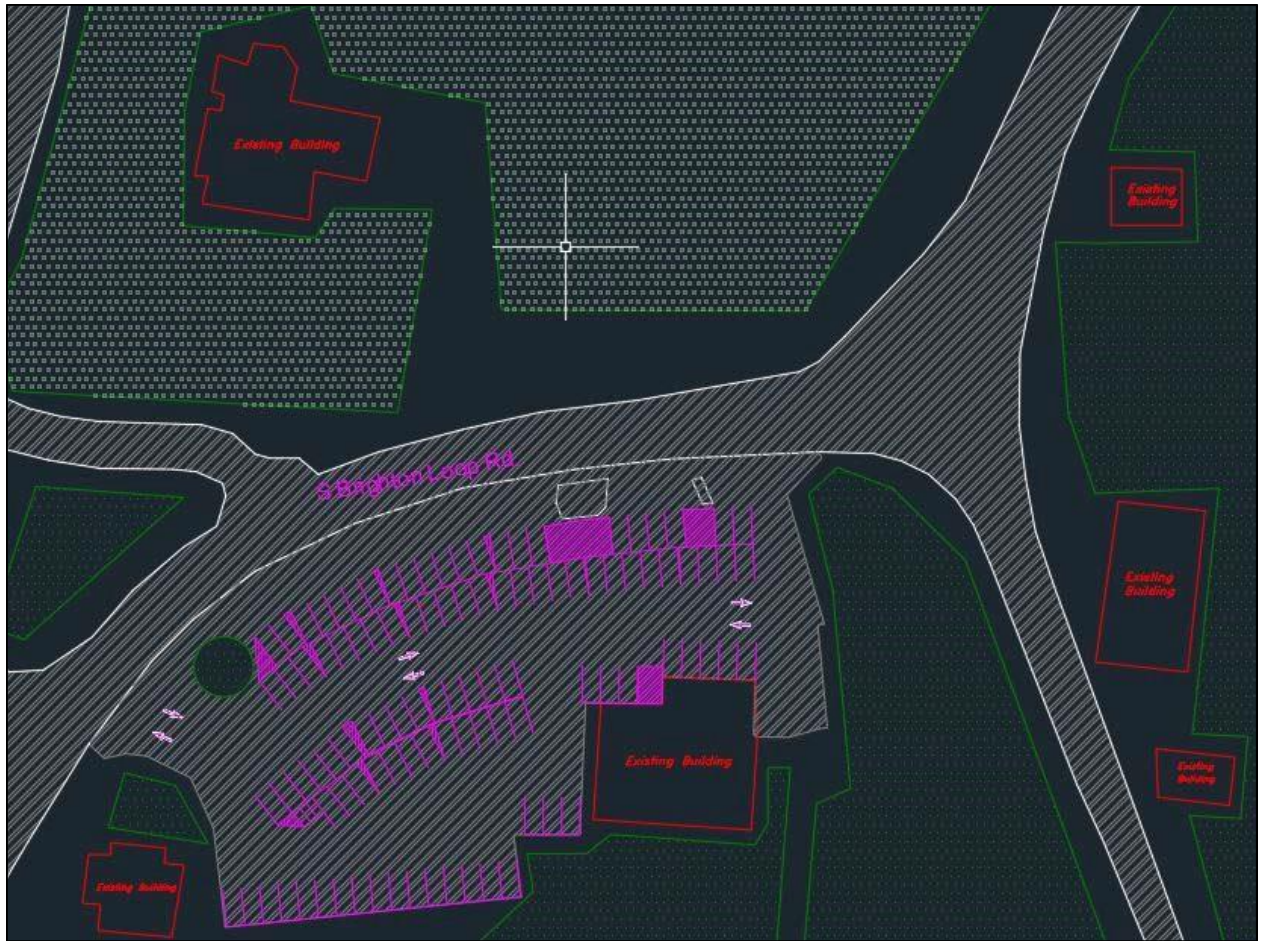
Proposed Striping Plan for Brighton Restaurant Lot
